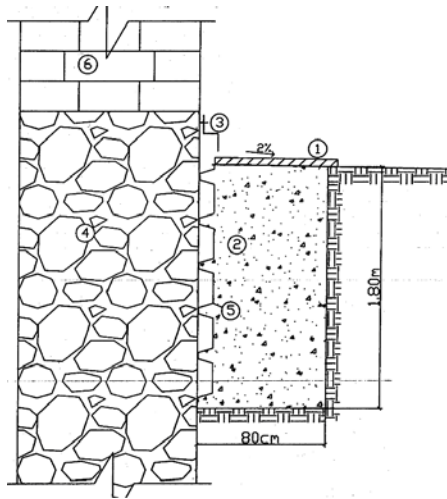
Ventilation exterior foundations side: 1 - Concrete Sidewalk; 2 - single layer gravel, sort (15-30) mm; 3 - "Z" profile from plastic or aluminium, 5 cm wing; 4 - Cathedral Foundation; 5 - Neps foil (Tefond, Fondaline type); 6 - Cathedral Wall
